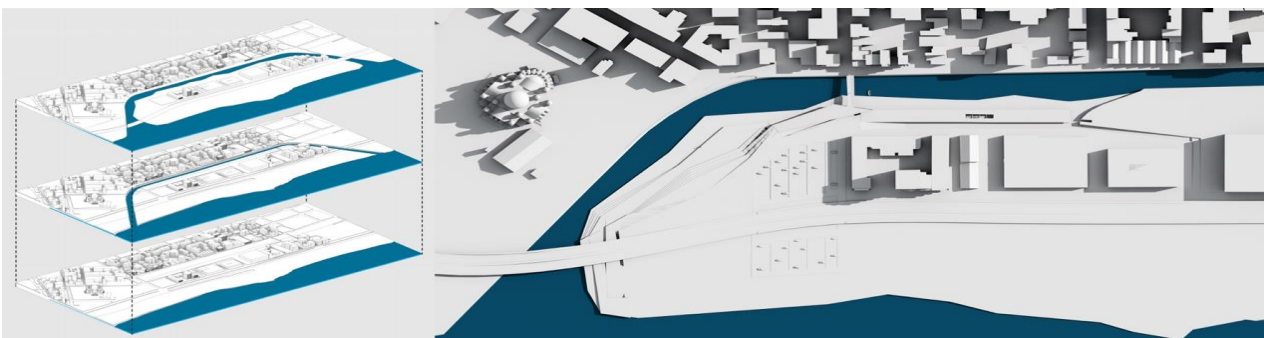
Topographic plan for canal excavation, by students Garefalaki, I. and Natsi, A
